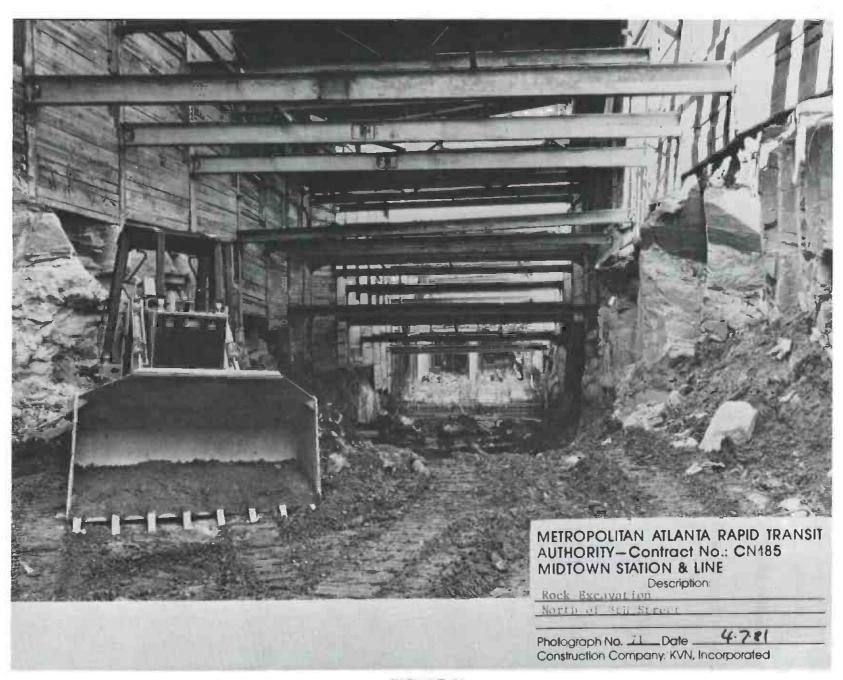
EXCAVATION BENEATH THE DECKING WITH HEAVY EARTH-MOVING EQUIPMENT
